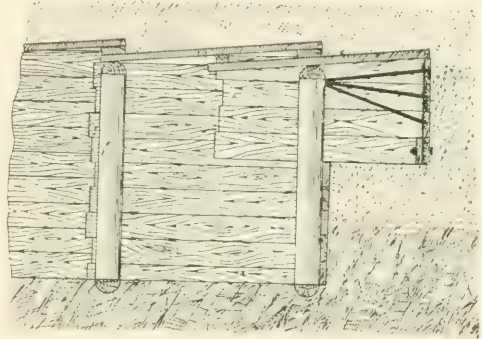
SIDE VIEW OF DRIVE SHOWING FACE LATHS AND BREASTERS DRIVEN HALF HOME.
